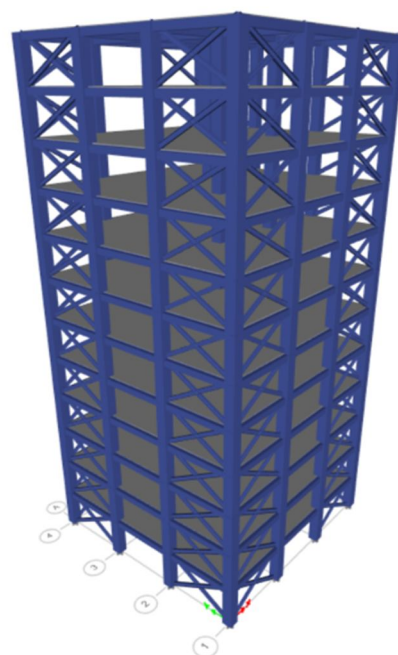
3D View of Structure and Arrangement of X-Bracing.
